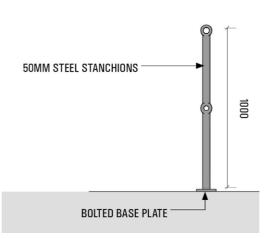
Indicative Section: Type 4 Safety Rail Scale 1:25 @A3
